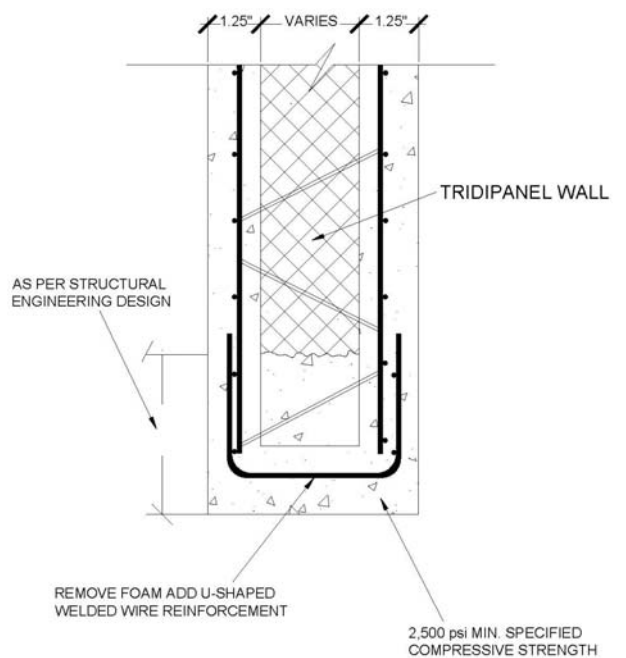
DETAIL OF LINTEL BEAM (FOR USE ON OPENINGS)
